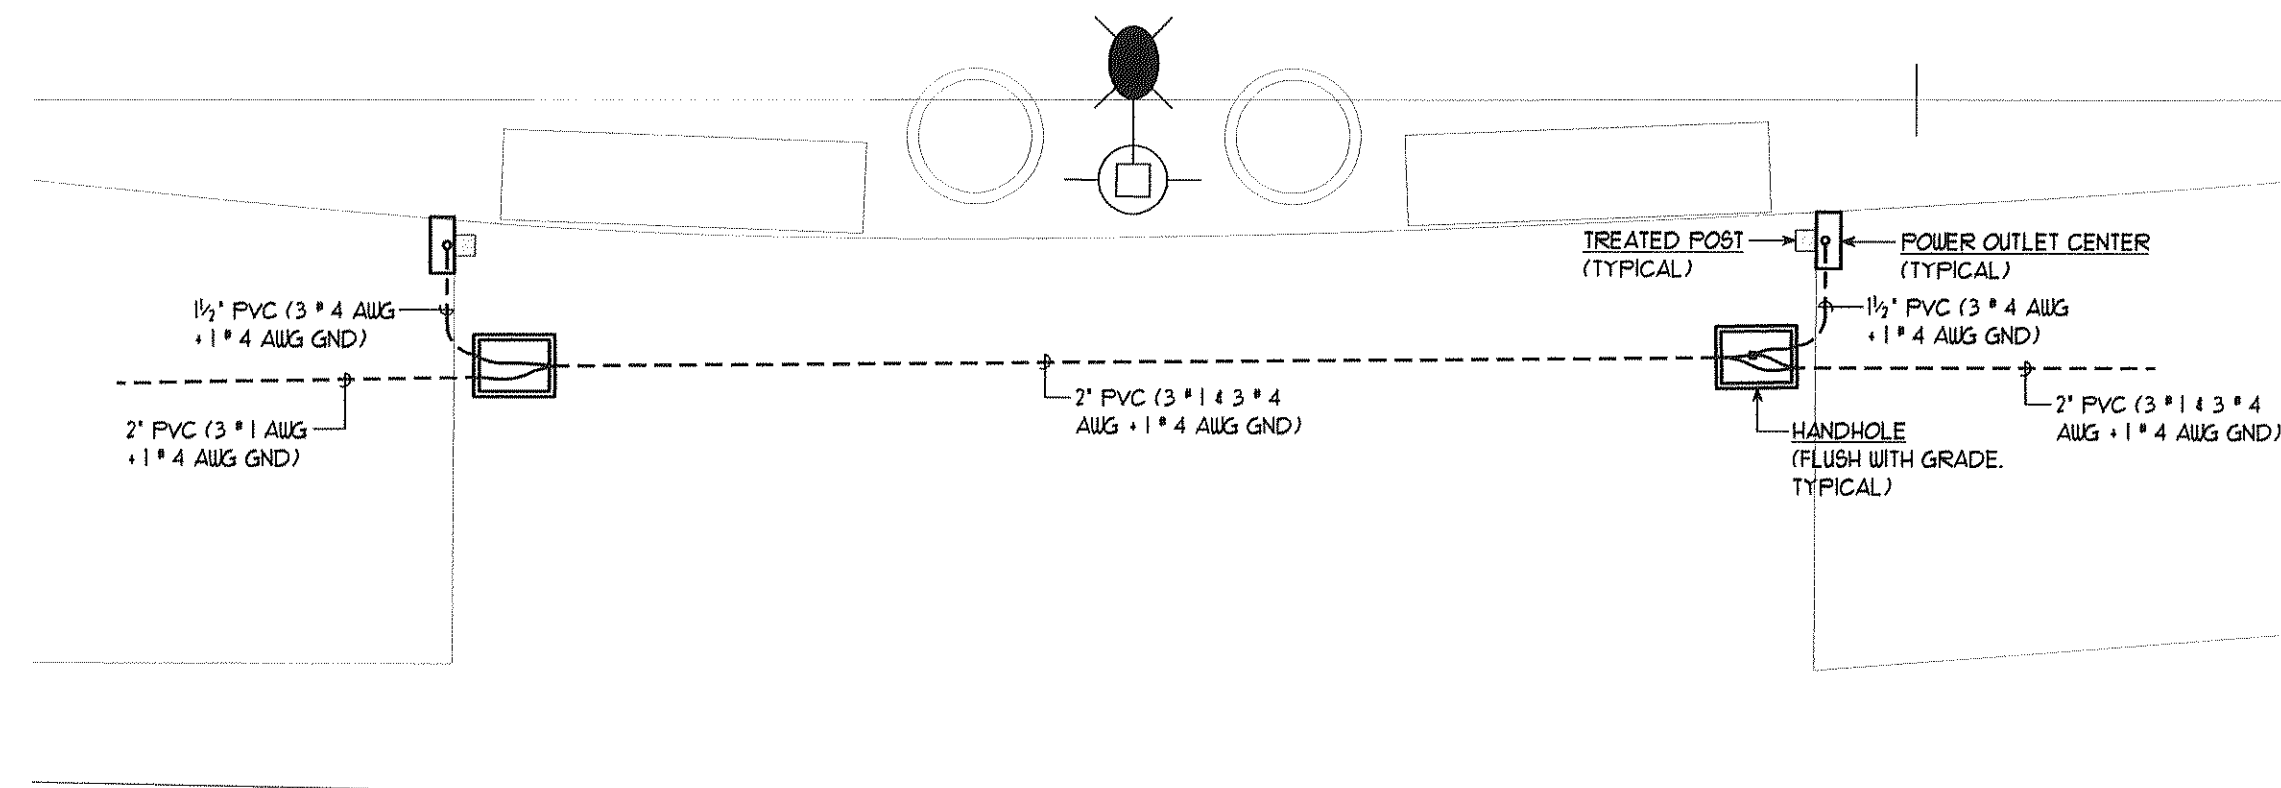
DETAIL - SOUTH ELECTRICAL EQUIPMENT ENCLOSURE
